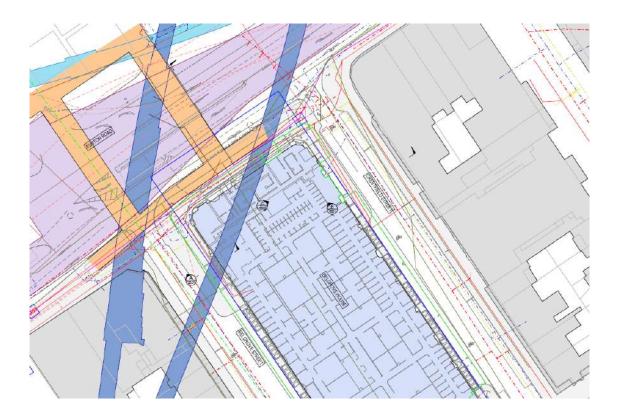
Extract of site constraint plan indicating location of Piccadilly Line tunnels and Kings Cross station entrance tunnels
